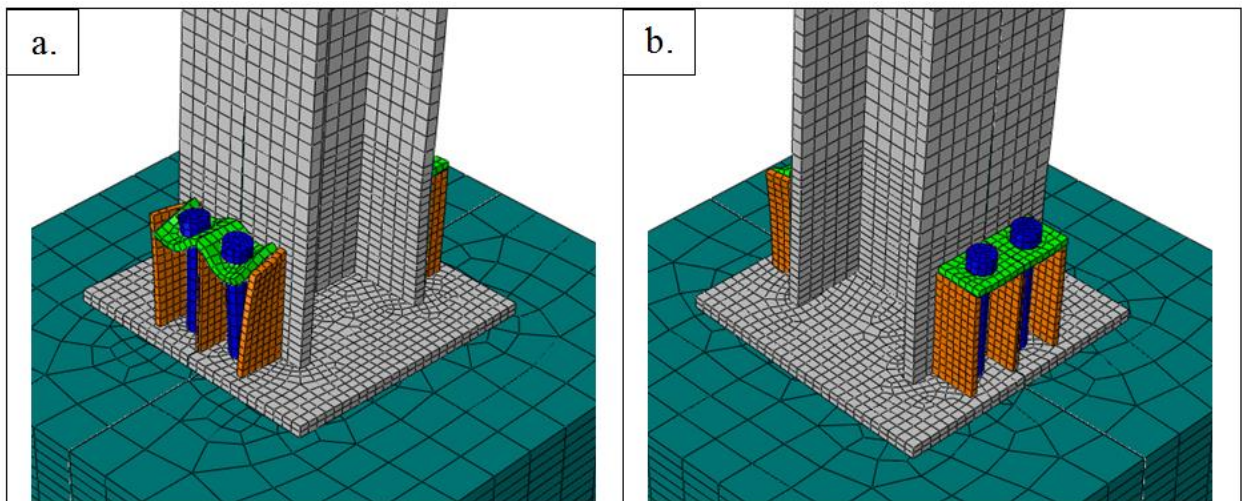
Deformation of model 3. a) Tensile flange, b) Compressive flange
